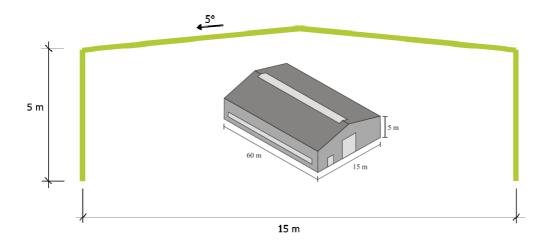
Dimensions of the single storey building and the regarded structural frame.
